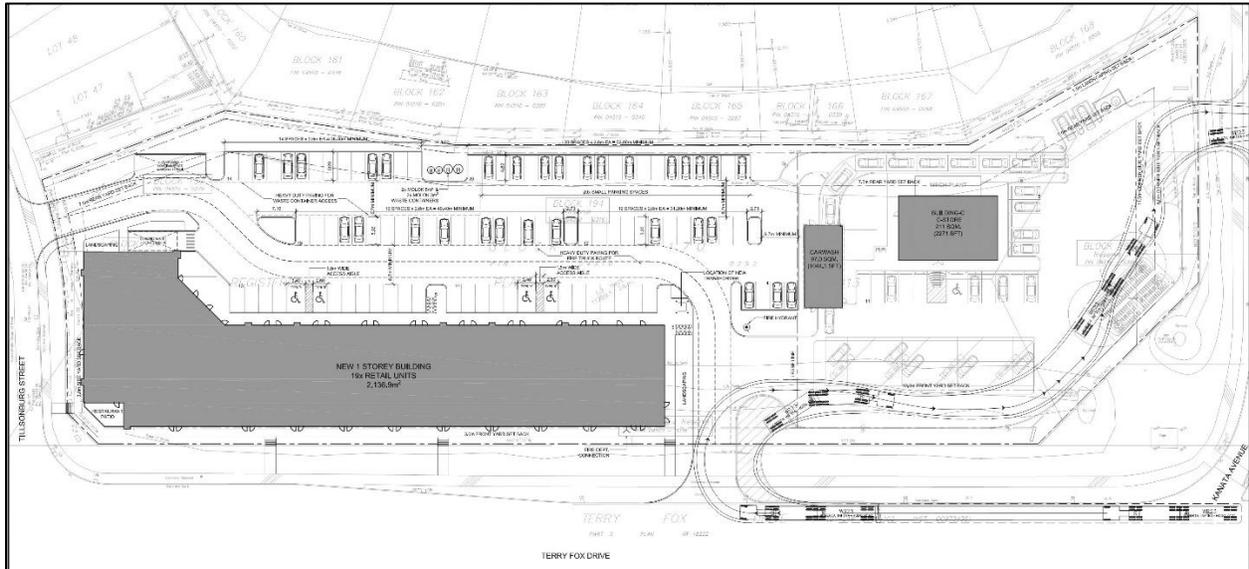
Site Plan for the proposed multi-unit building and gas station development.
